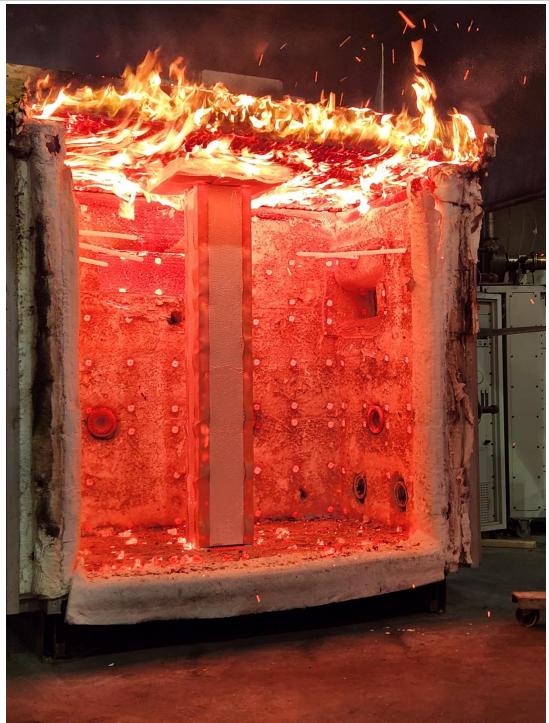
CLT with Gypsum Protected HSS Steel Column Including Corner Flashing After Fire Endurance Exposure
